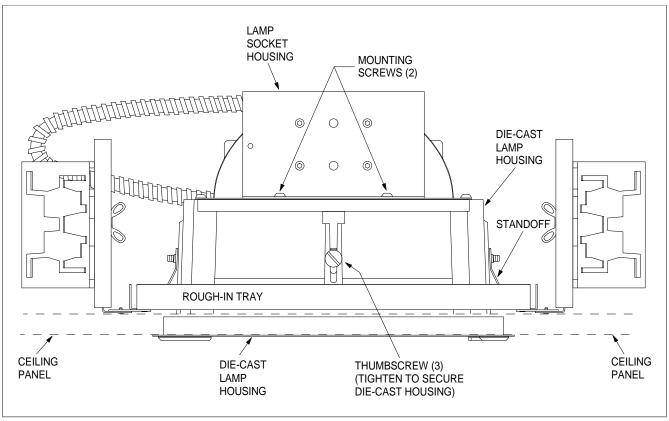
Lamp Socket Housing and Die-cast Lamp Housing Installation
